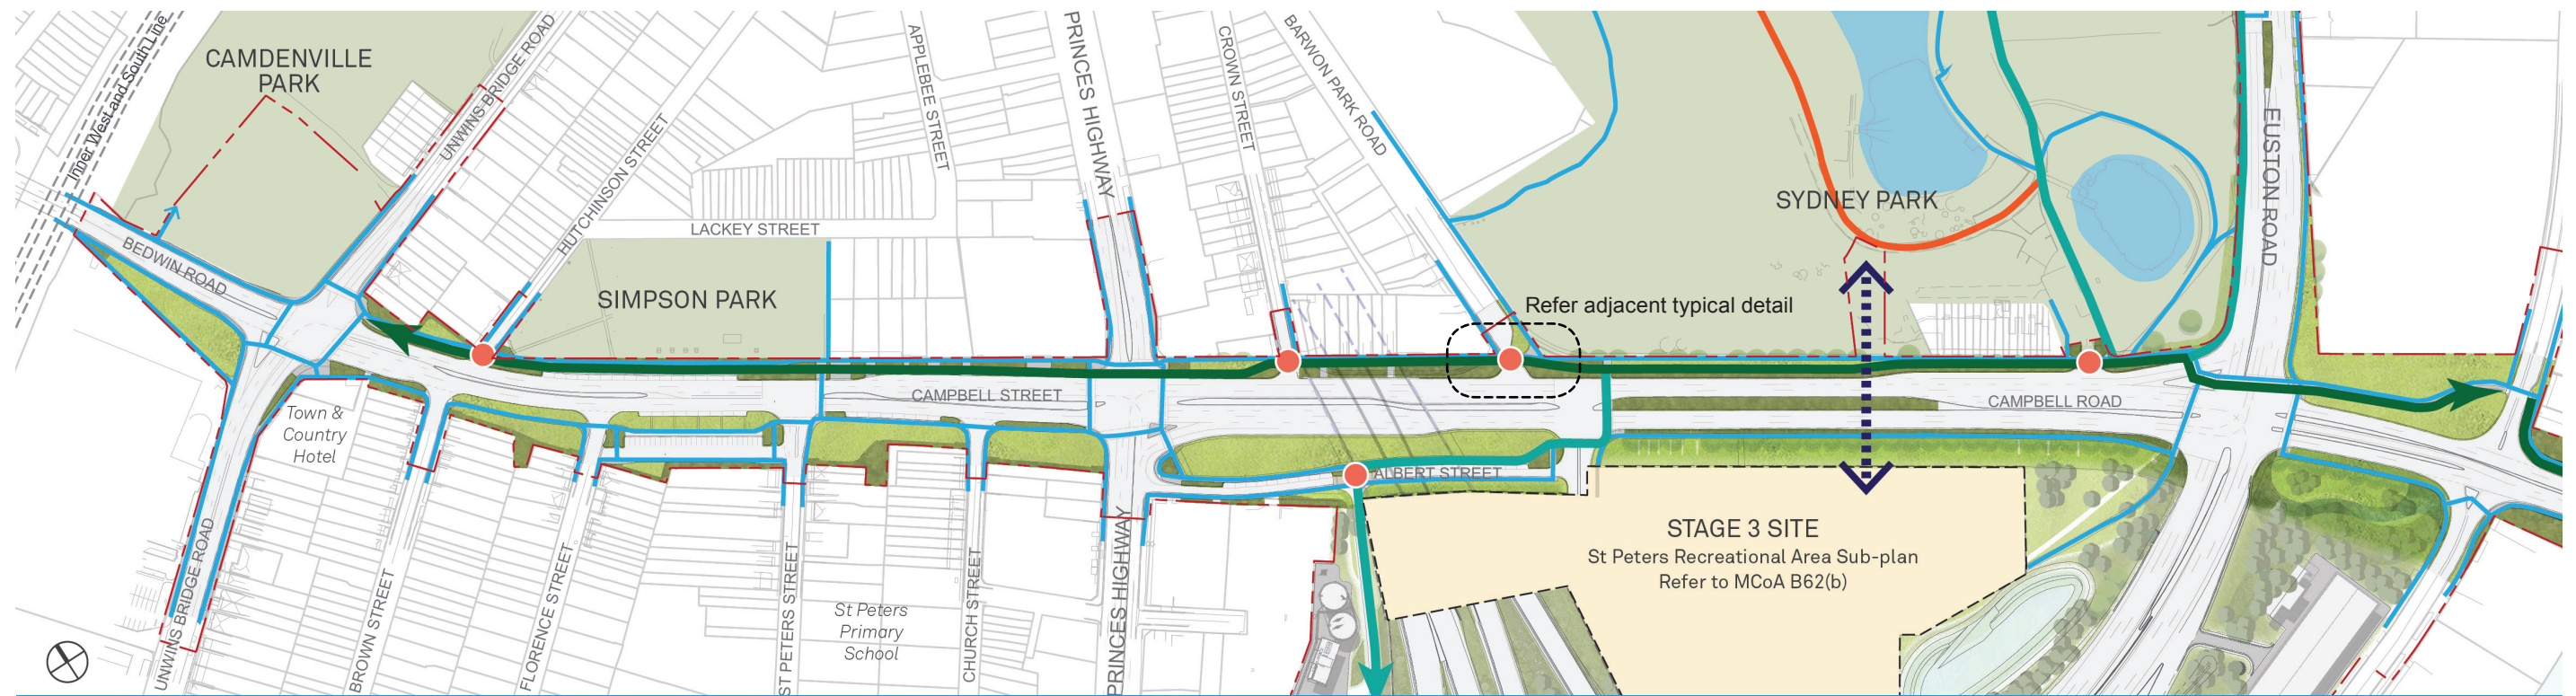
Campbell Street Green Link - Access Strategy - Plan
